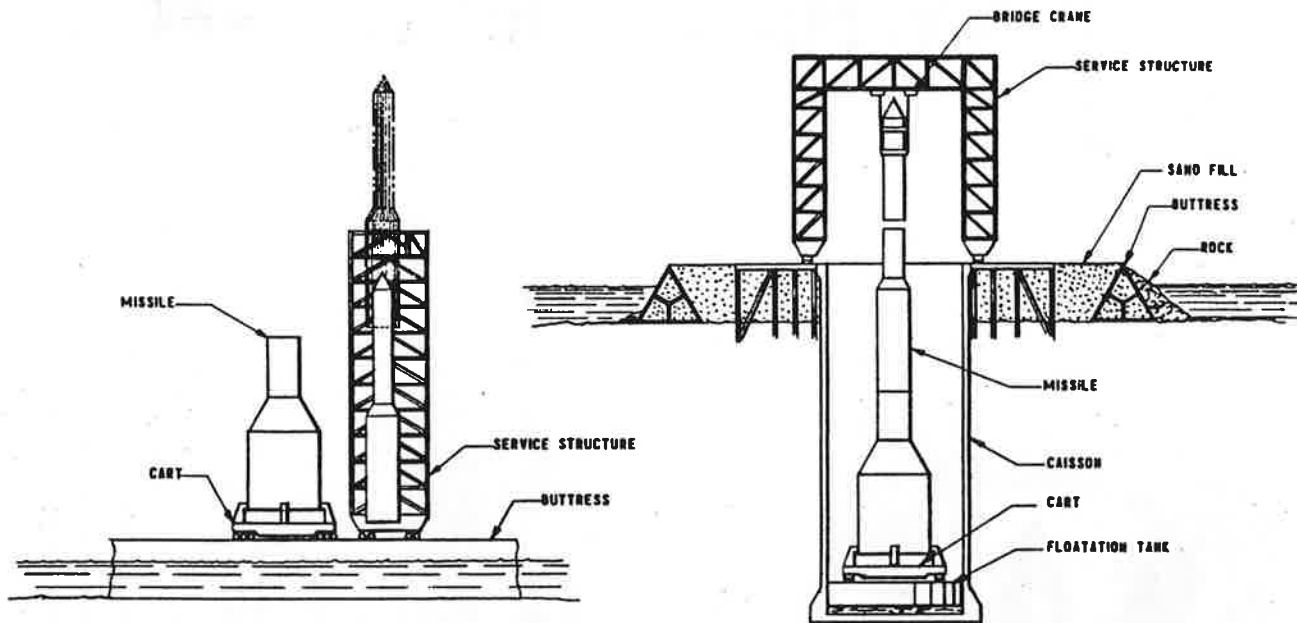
This off shore facility design allowed Nova stages to be assembled using a unique flotation tank system that would lower the vehicle for easier assembly of upper stages. Drawing courtesy NASA
